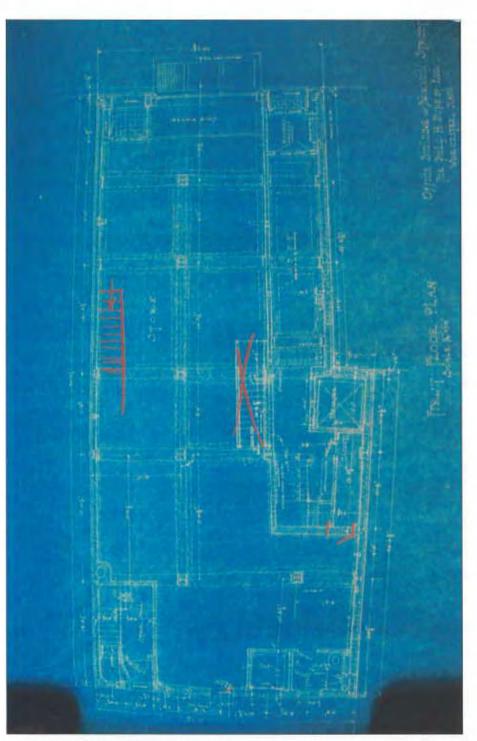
1924 Duprey Building, first floor plan. Reproduced by permission from the Massachusetts State Archives.
